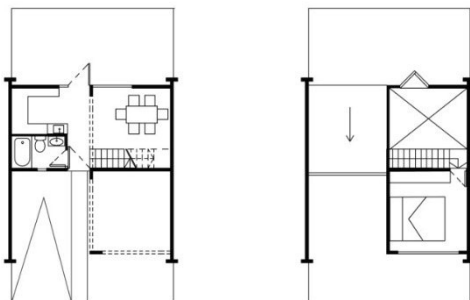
Floor plan of the base house in Las Higueras (source: the author)
